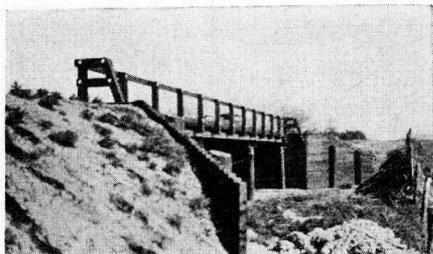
Pile Braced Laminated Timber. Courtesy of Amer. Wood Preservers Assn.
